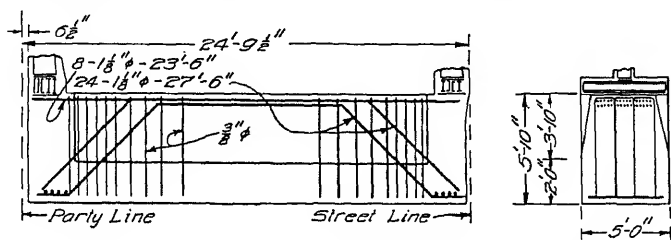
Footing of Allman Building, Philadelphia, Pennsylvania
